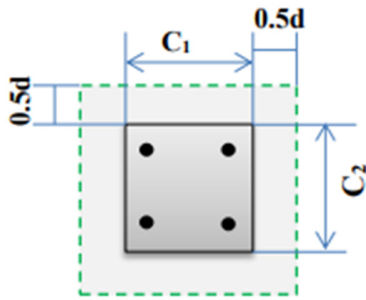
Critical slab section without shear reinforcement for punching shear.
